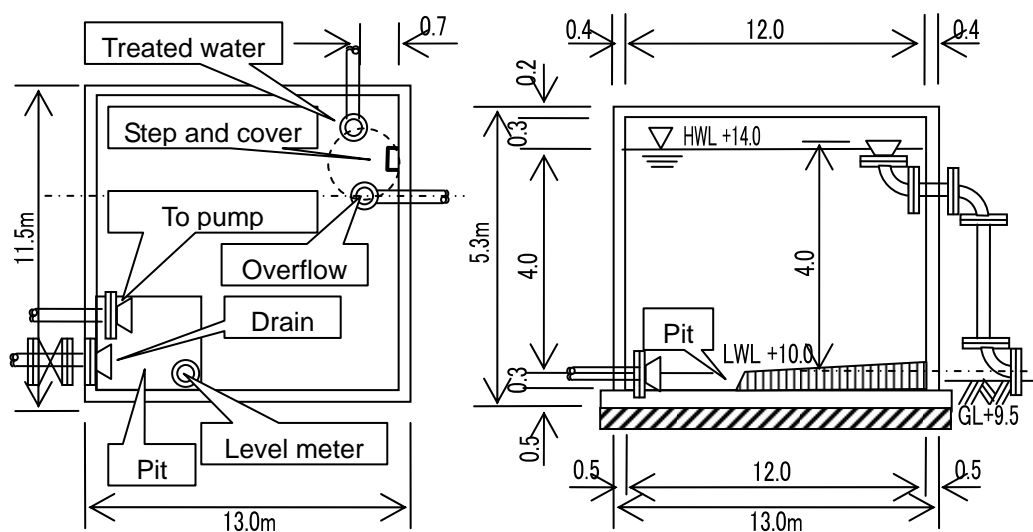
Structure of Desalinated Water Storage Tank
